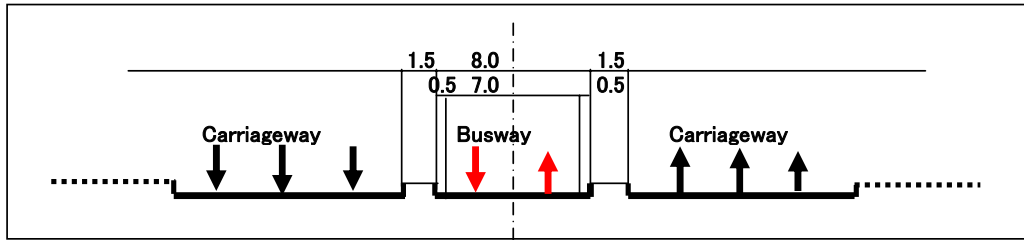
Typical Cross Section of Trunk Bus Exclusive Road
